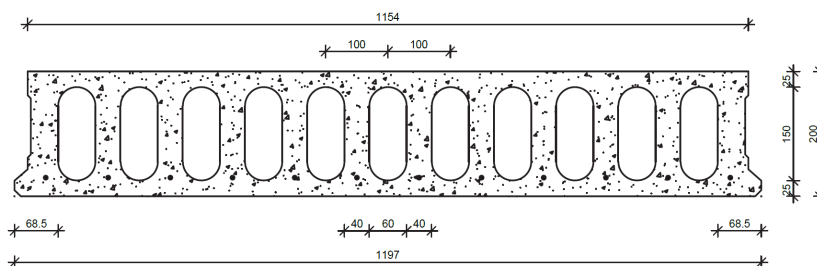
Cross section of hollow-core unit (Concrete Manufacturers Association, 2011)
